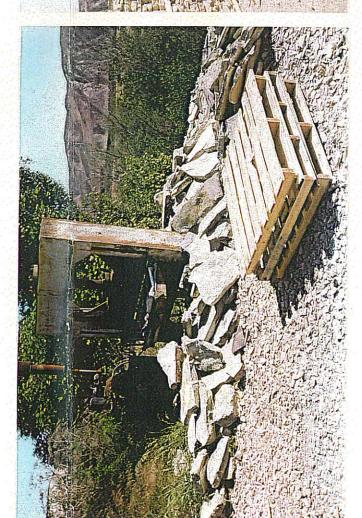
"STONE GUILLOTINE" & TYPICAL PALLETS
